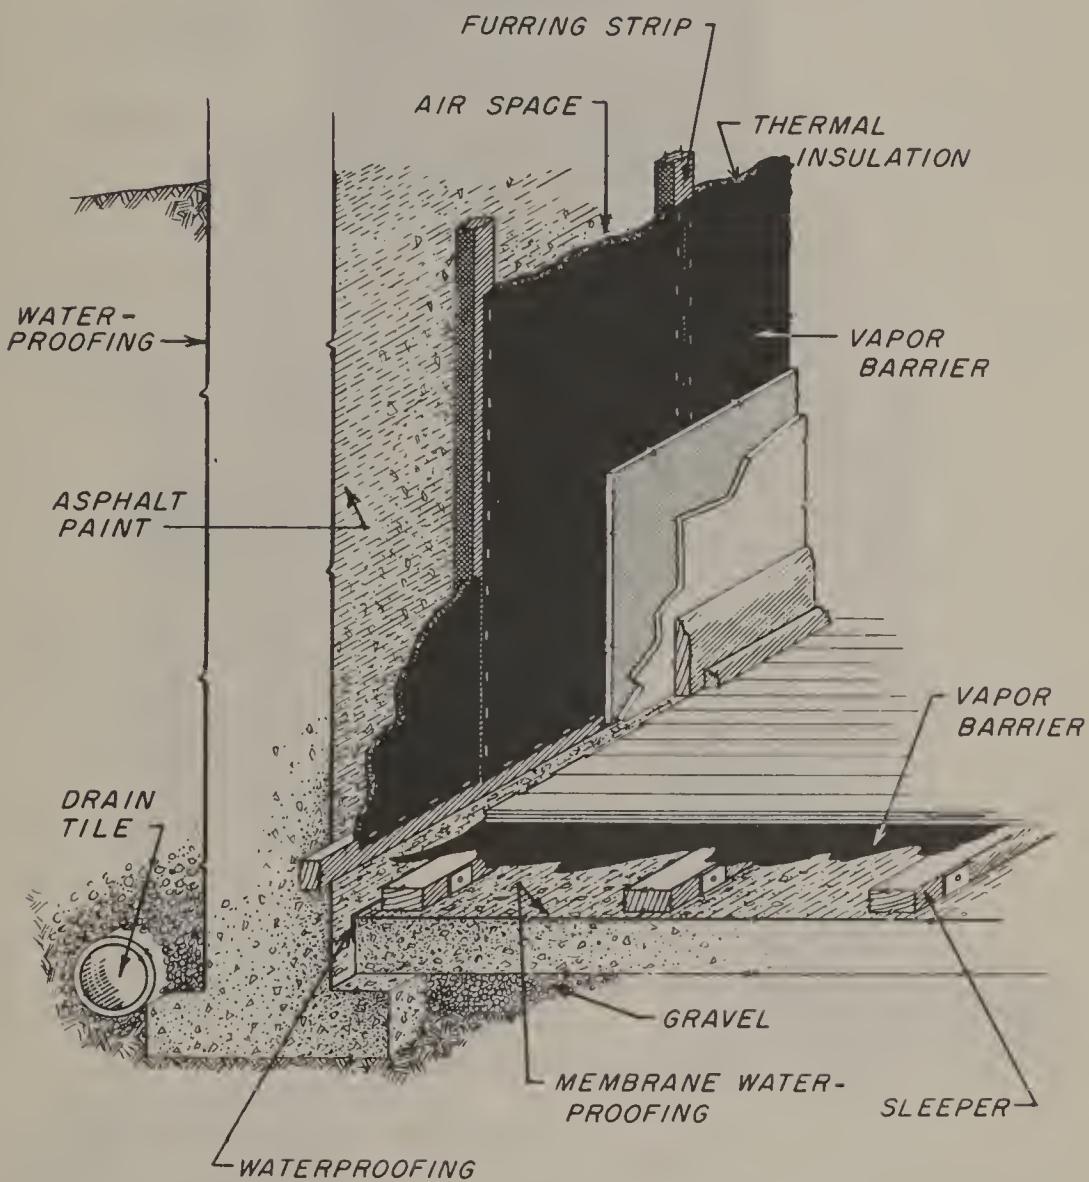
Outside basement wall, plaster finish, floor treatment.
